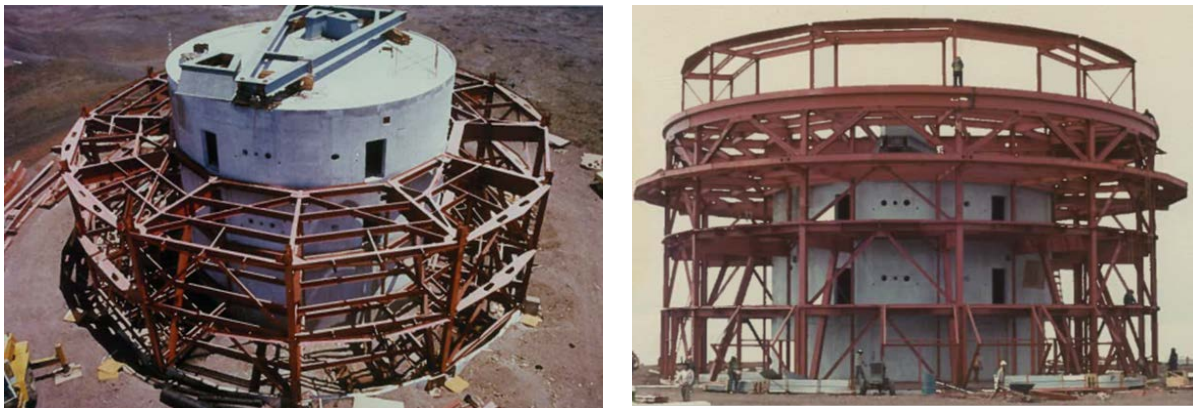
Canada France Hawaii Telescope pier under construction – the inner cylindrical concrete building is the telescope pier and the outer ring steel structure is the enclosure pier.
